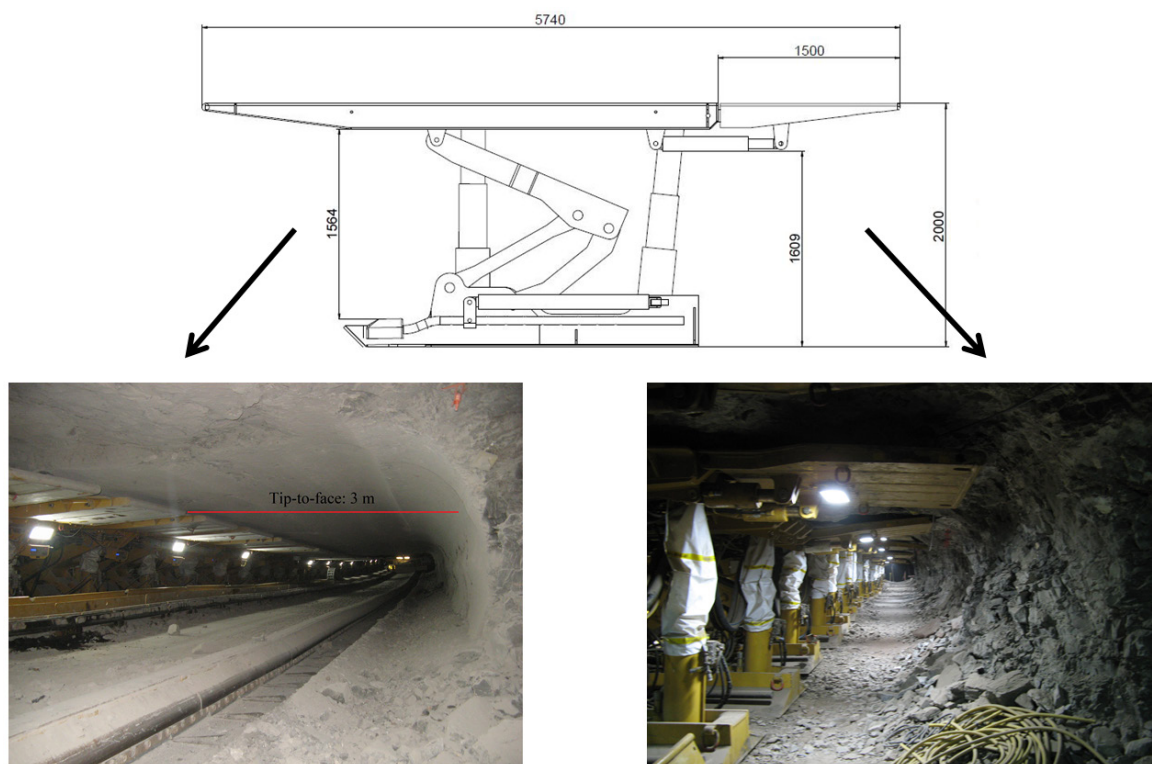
Outline of the powered roof support applied in the 5A/1 longwall panel at the set-up stage.
